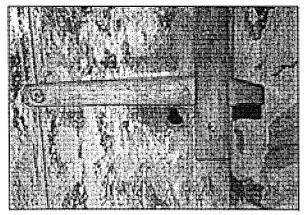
Wooden Latch in Basement of Center Section, Room 006, Door 1-006.
